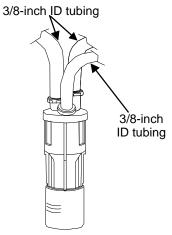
Unit mounts inside 1-1/2-inch diameter drain standpipe
